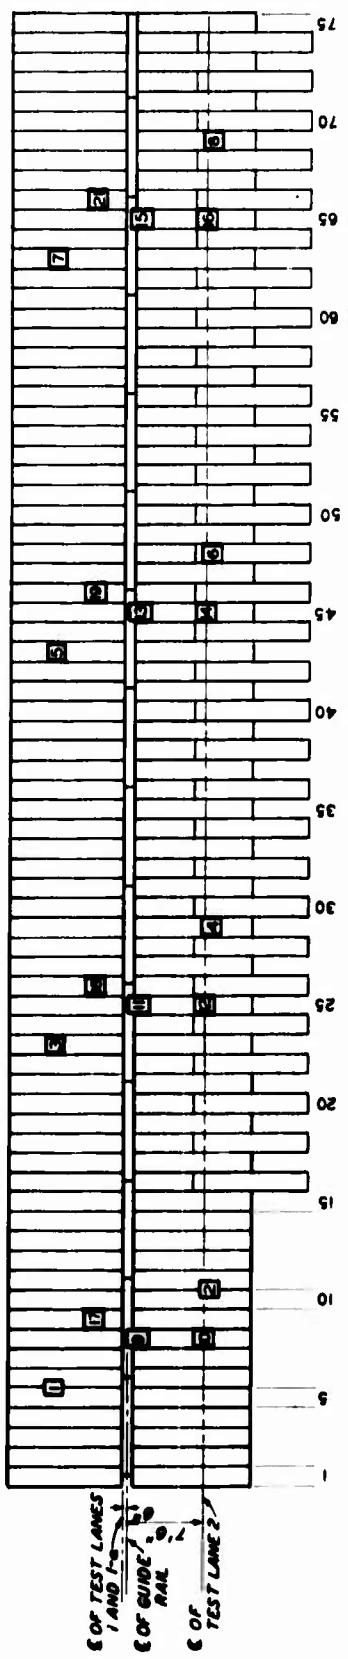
PLAN TEST LANES 1, 2 AND 1-a
